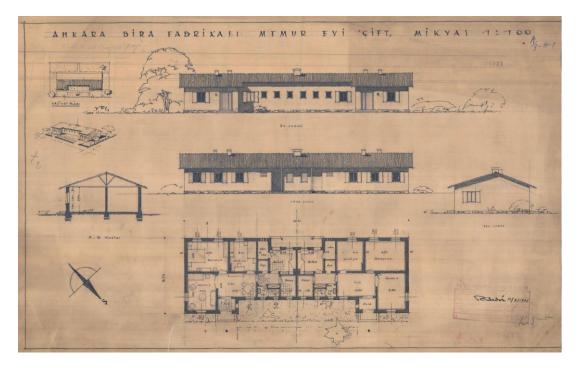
The original drawing sheet of the first proposal of the double dwellings of officers, the plan, section and elevations, Construction Section in General Directorate of TEKEL, 14.03.1941 (Source: TTA Archive)
